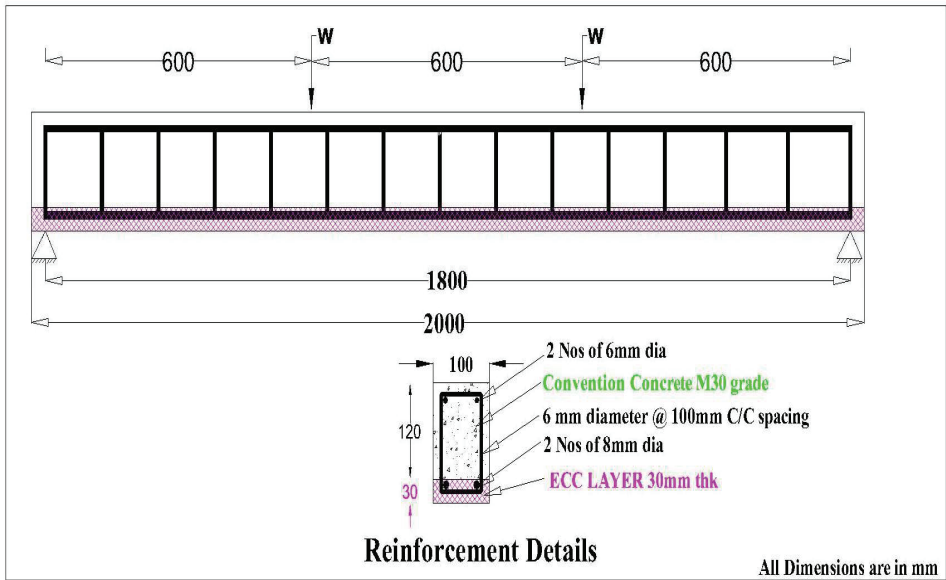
Dimension parameters, reinforcement details, and position of ECC layer
